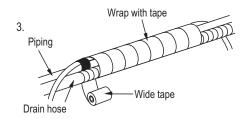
Indoor Unit to Field-Installed Piping Connection.
